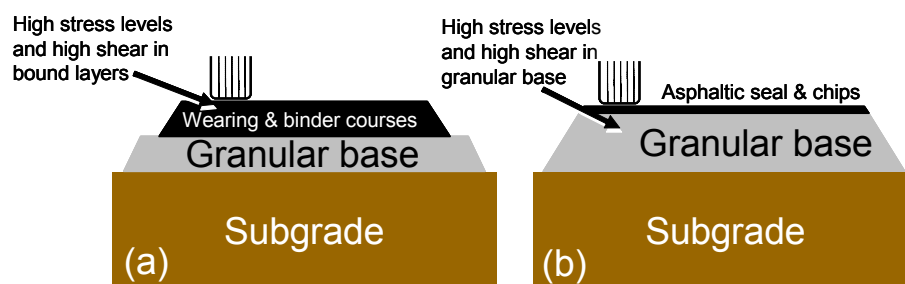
Schematic profile of (a) high-volume road & (b) low-volume road pavement
